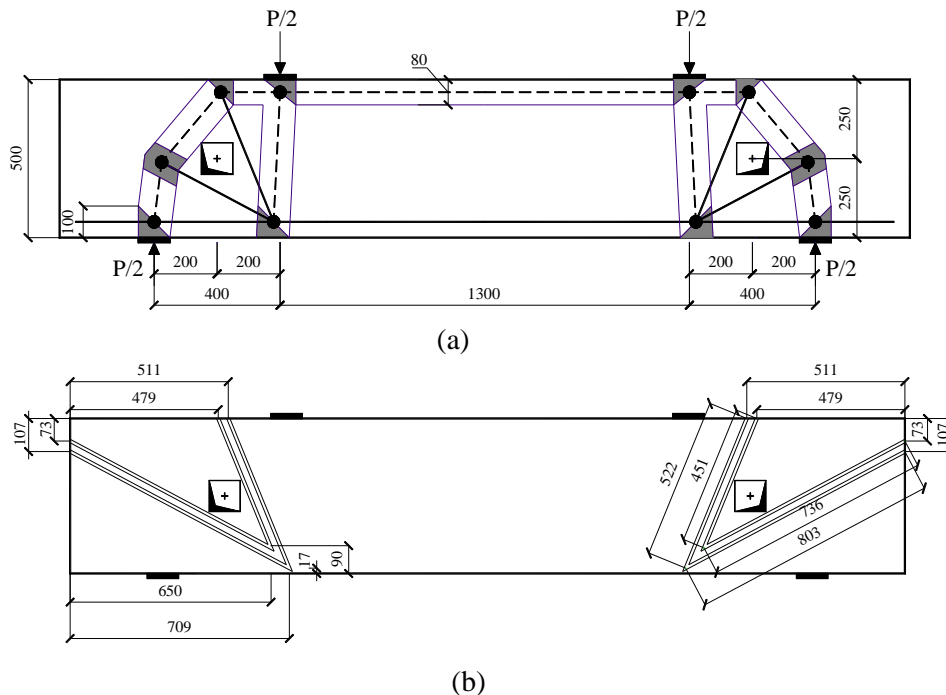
Specimens' details; (a) schematic of the STM, (b) NSM-CFRP strengthening layout.
